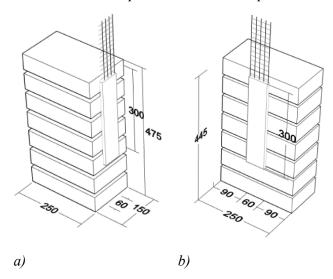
Bond test specimens: a) Tuff substrate, b) clay bricks substrate.
